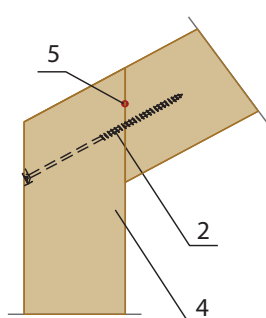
DETAIL OF THE "T"-JUNCTION JOINT 124, 84, 62
